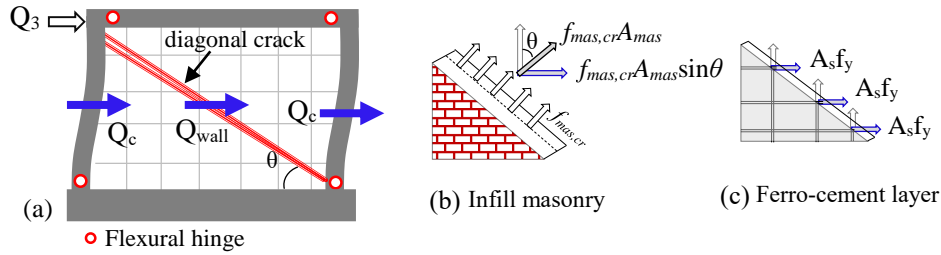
(a) Schematic diagram of diagonal cracking failure, (b) cracked infill masonry and (c) cracked Ferro-cement layer
